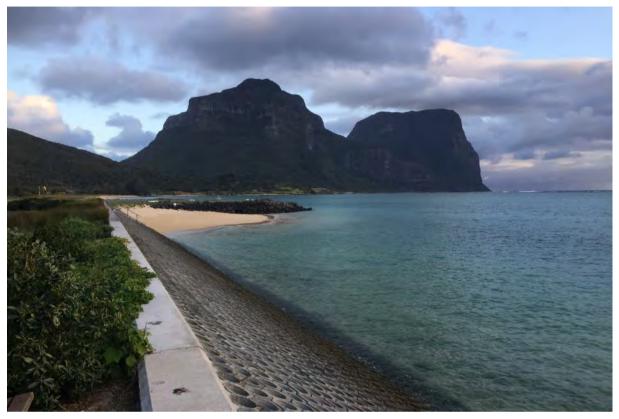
Looking south-west from Windy Point towards the Airport. The end of the existing runway can be seen on the rock/reclaimed land structure.
